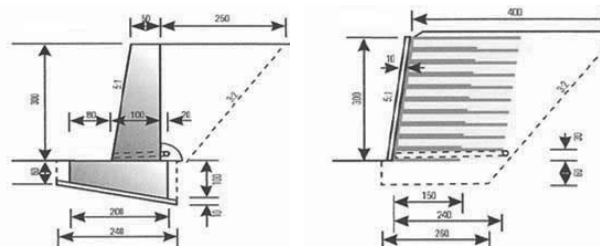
Scheme of the concrete reinforced retaining wall (CRRW, left) and the geosynthetics reinforced retaining wall (GRRW, right)
